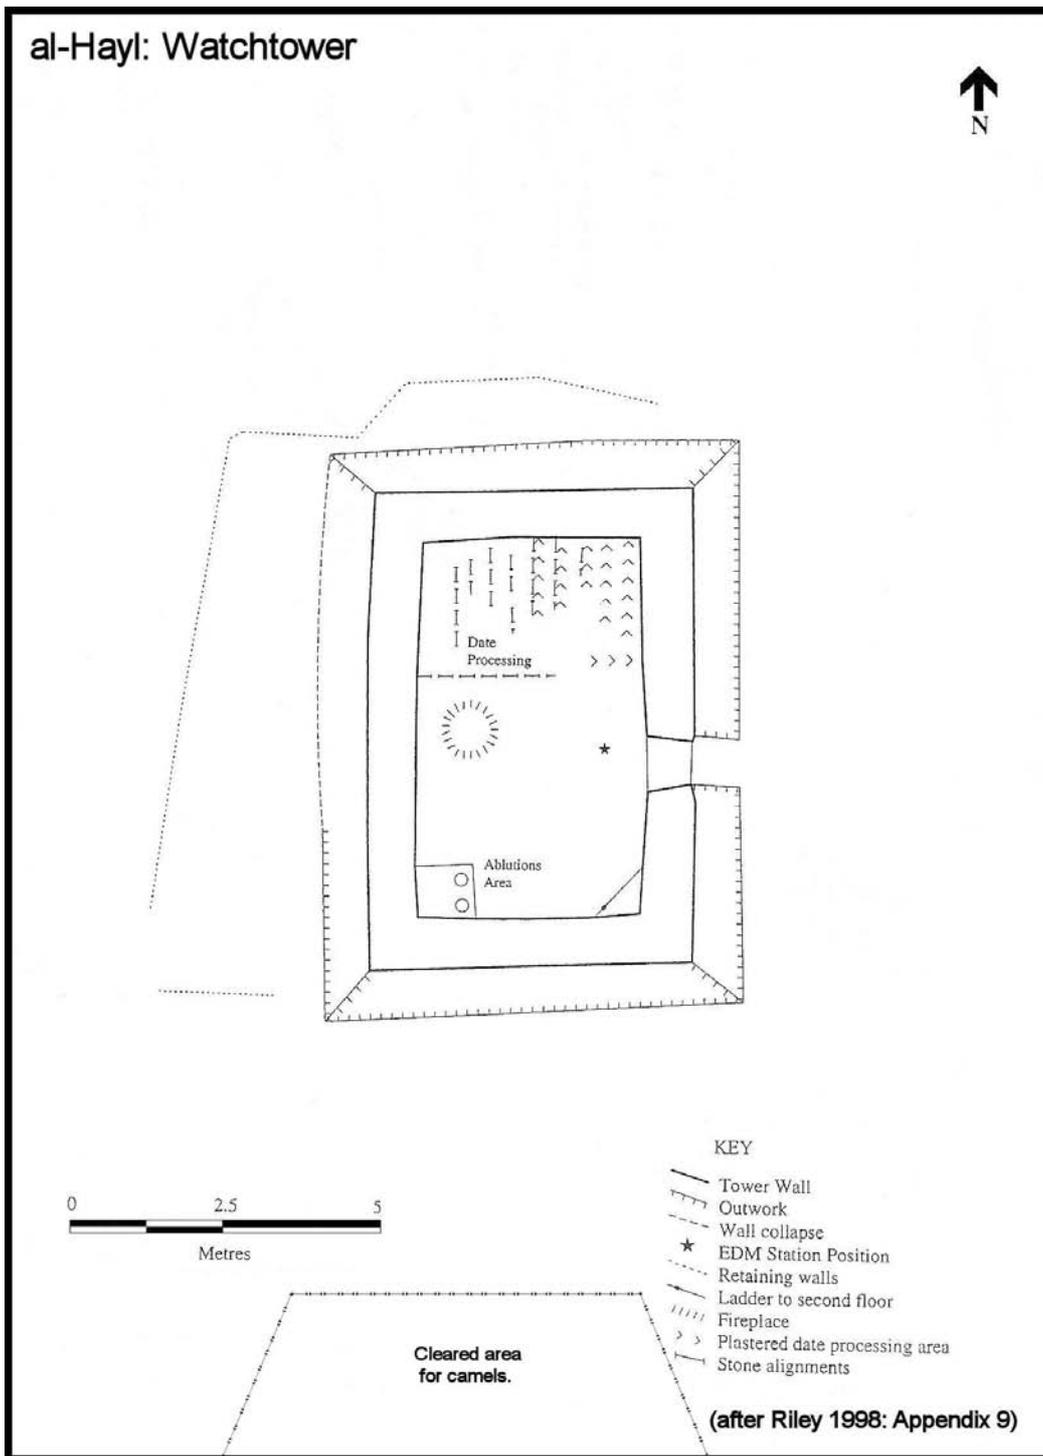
Plan for external watchtower (after Riley 1998: Appendix 9).
